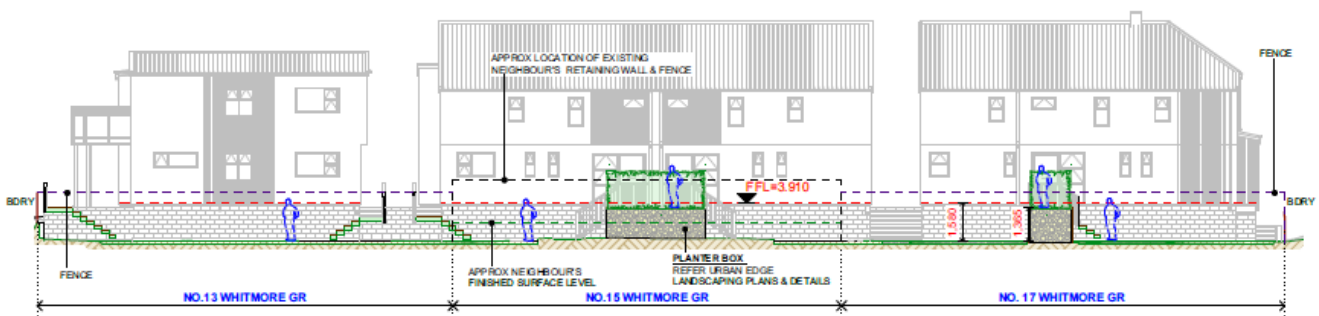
South west boundary elevation. Source: Application plans, sheet 15.
